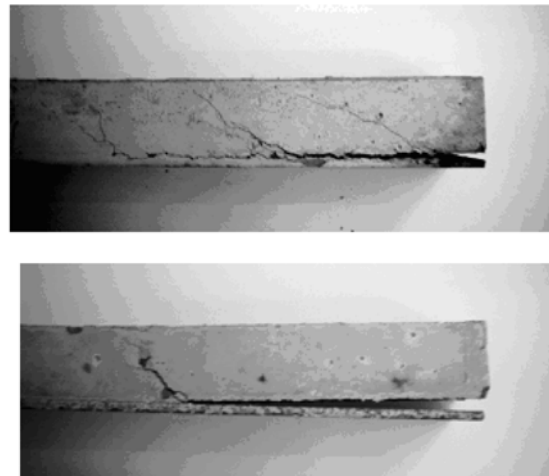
Failure modes. Top: Notched composite beam, beside the interfacial cracking a number of cracks in the bulk material is observed. Bottom: Un-notched composite beam after failure, a dominant interface crack is observed.
